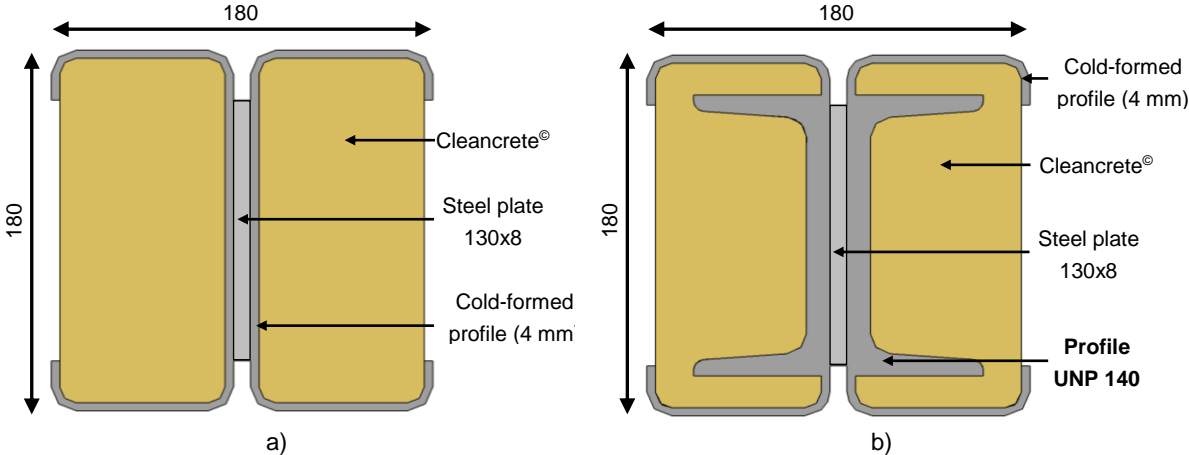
a) “Standard” and “modified” Stahlkammer cross-sections with dimensions (in mm).
